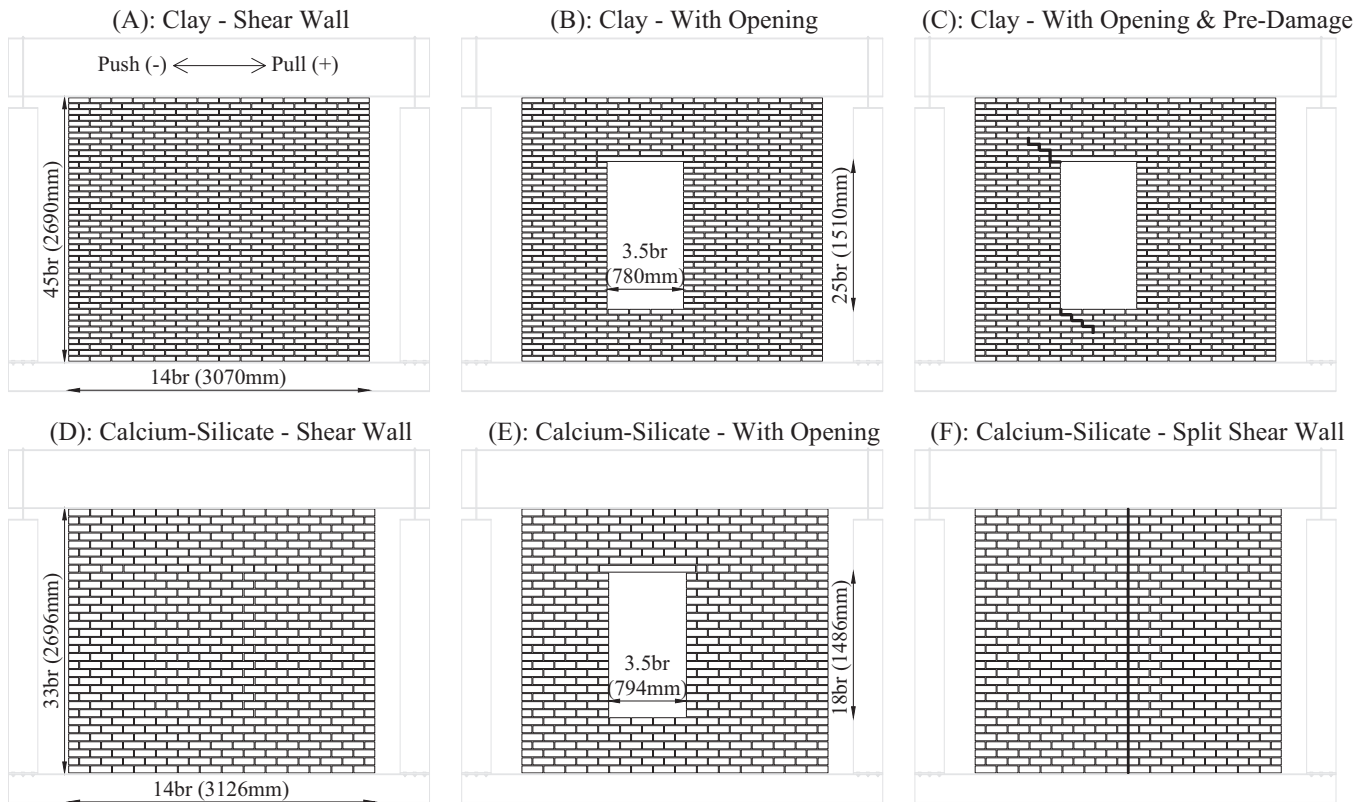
Scheme of various wall types tested during the light-damage campaign to characterise crack propagation in solid fired-clay (CLBR) and calcium-silicate brick (CSBR) masonry walls.
